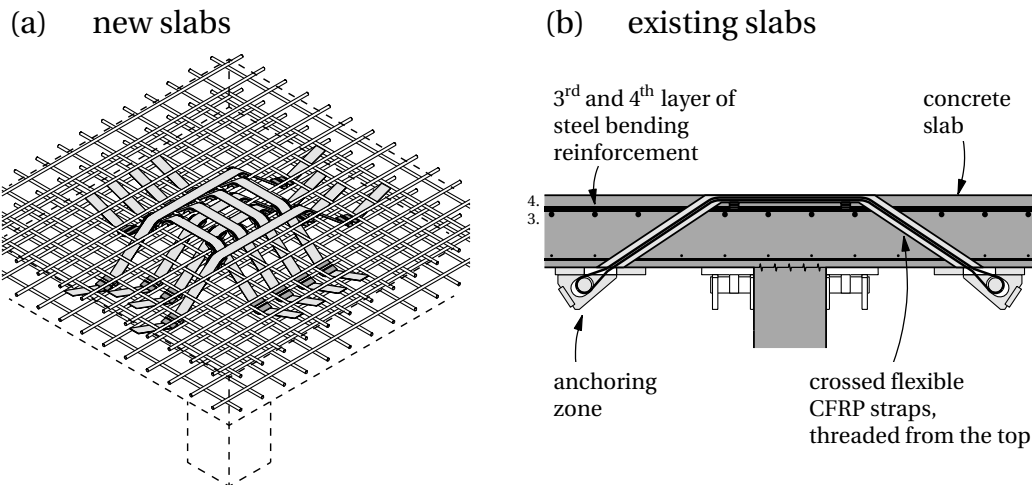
Arrangement of CFRP punching shear reinforcement: (a) in new slabs; (b) prestressed in existing slabs
